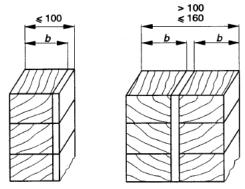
Test bars to be cut from a full cross-sectional specimen.
